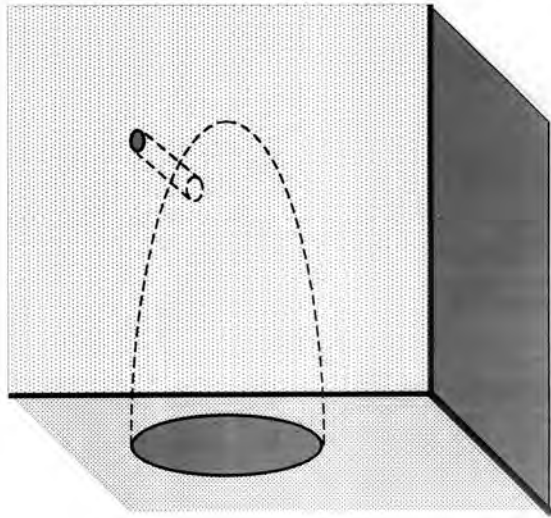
Drawing of recessed cone (drawing by Jean-Pierre Protzen).
